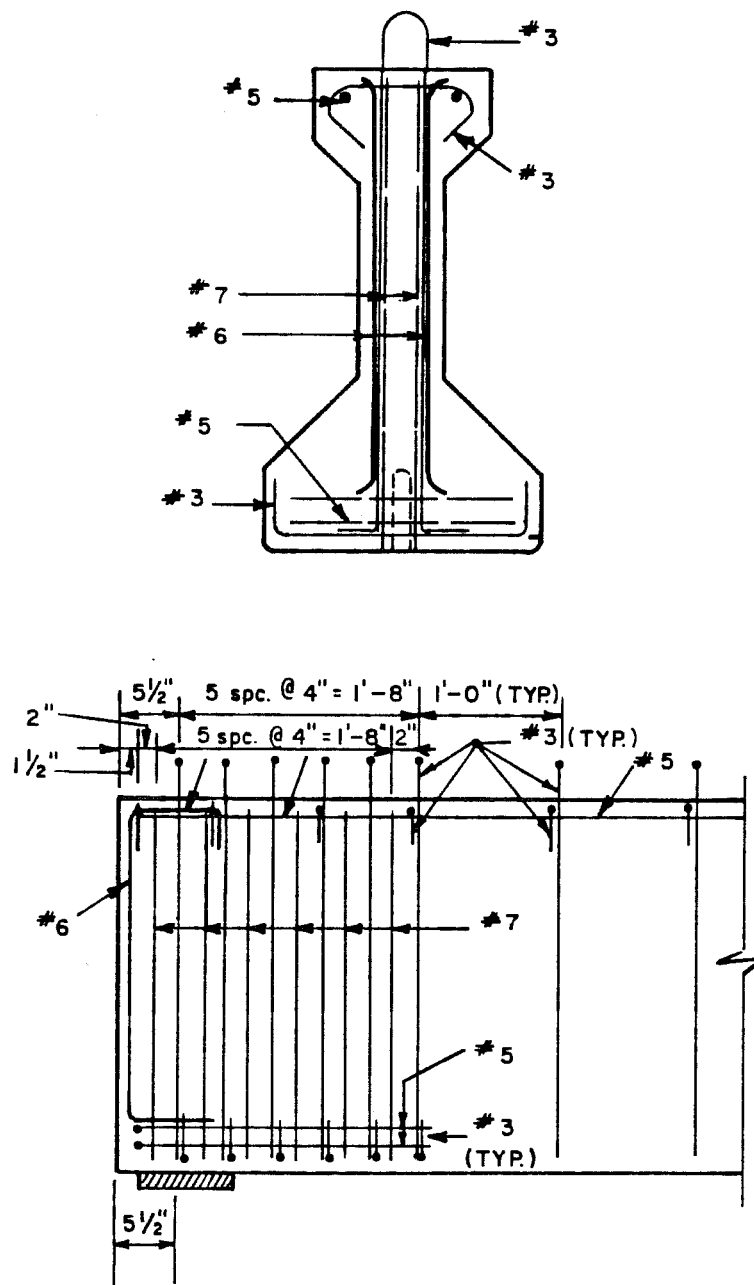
Texas SDHPT standard end reinforcement detail for Type IV girder
